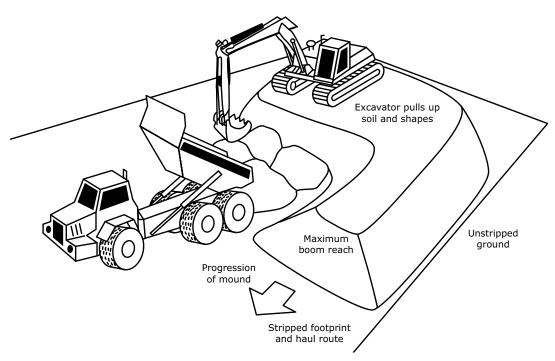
Soil storage mound construction with excavators and dump trucks: Single tier mound.
